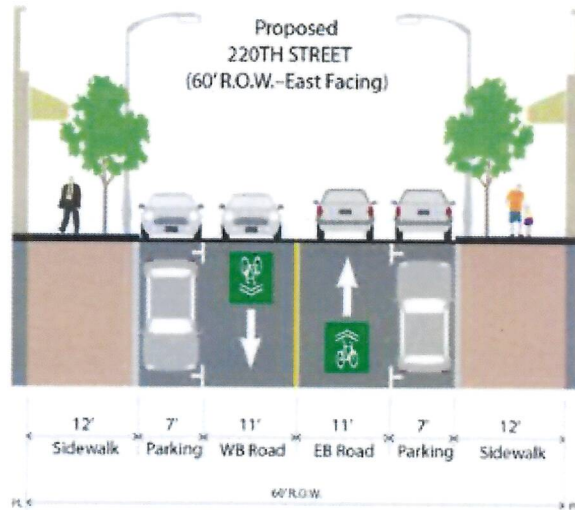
Proposed 220th Street Pedestrian Bridge Improvements
